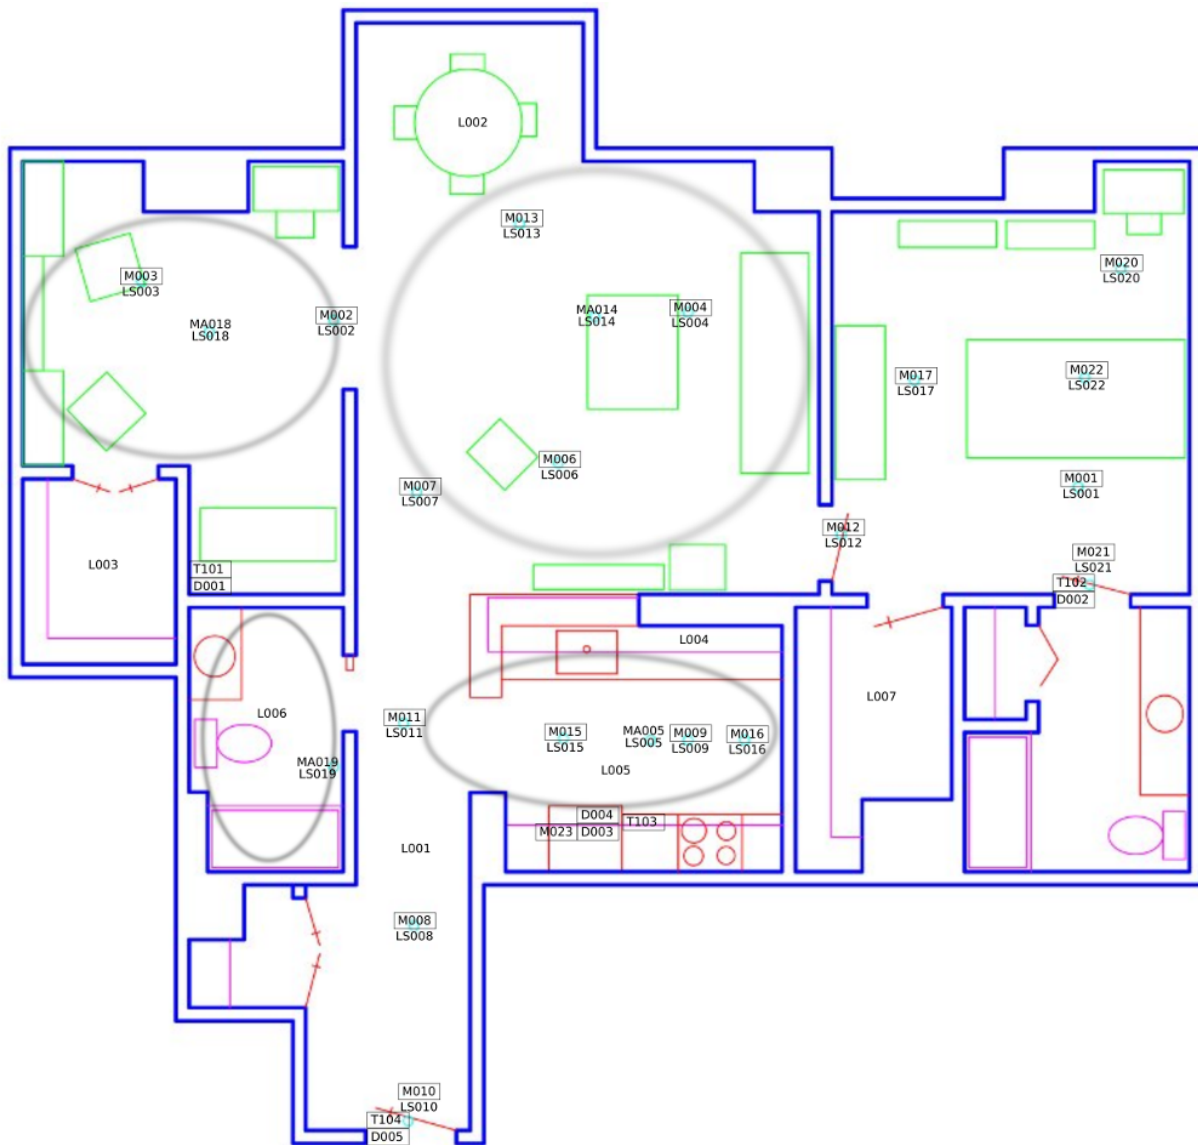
Floor plan and sensor placement for the testbed hh108.
